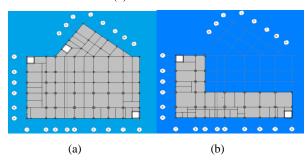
Plan for rigid frame with SW: (a) GF to 3^{rd} floor & (b) 5^{th} floor to roof
